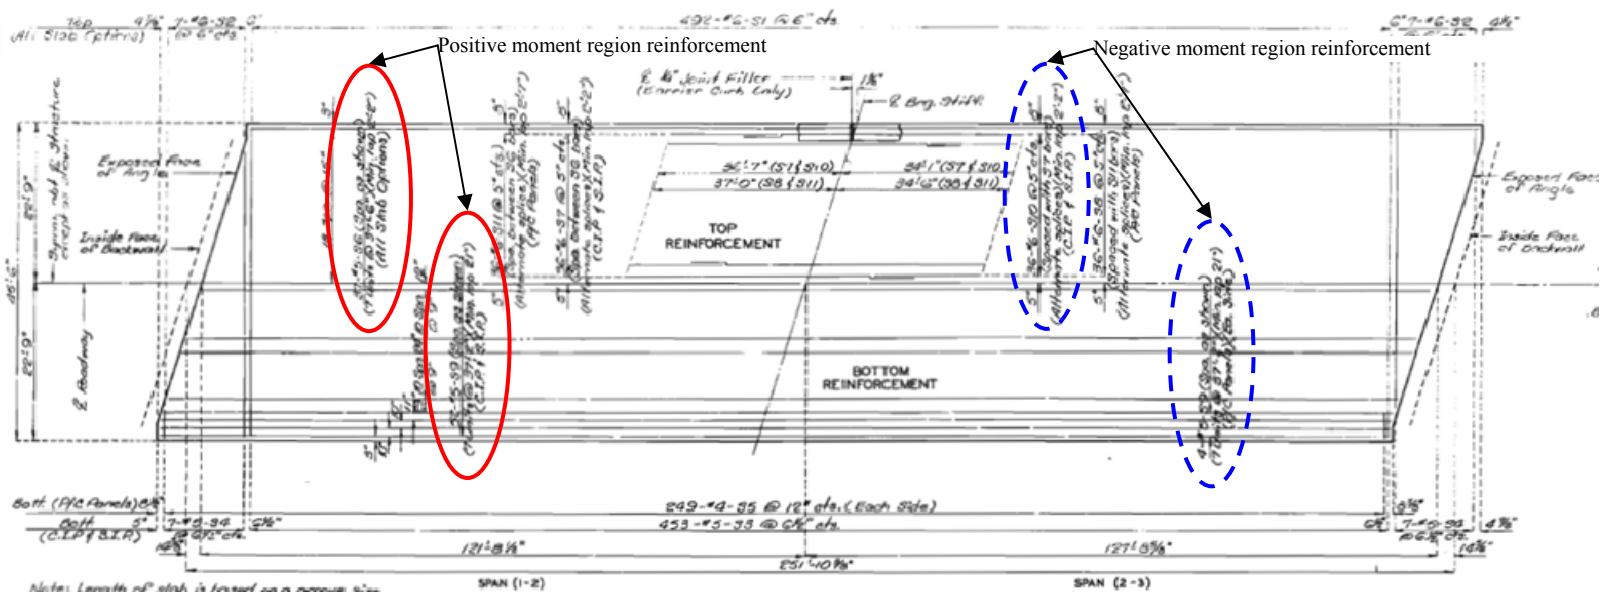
CIP Deck Reinforcement Detail of Bridge A4709 (Mexico, MO)
